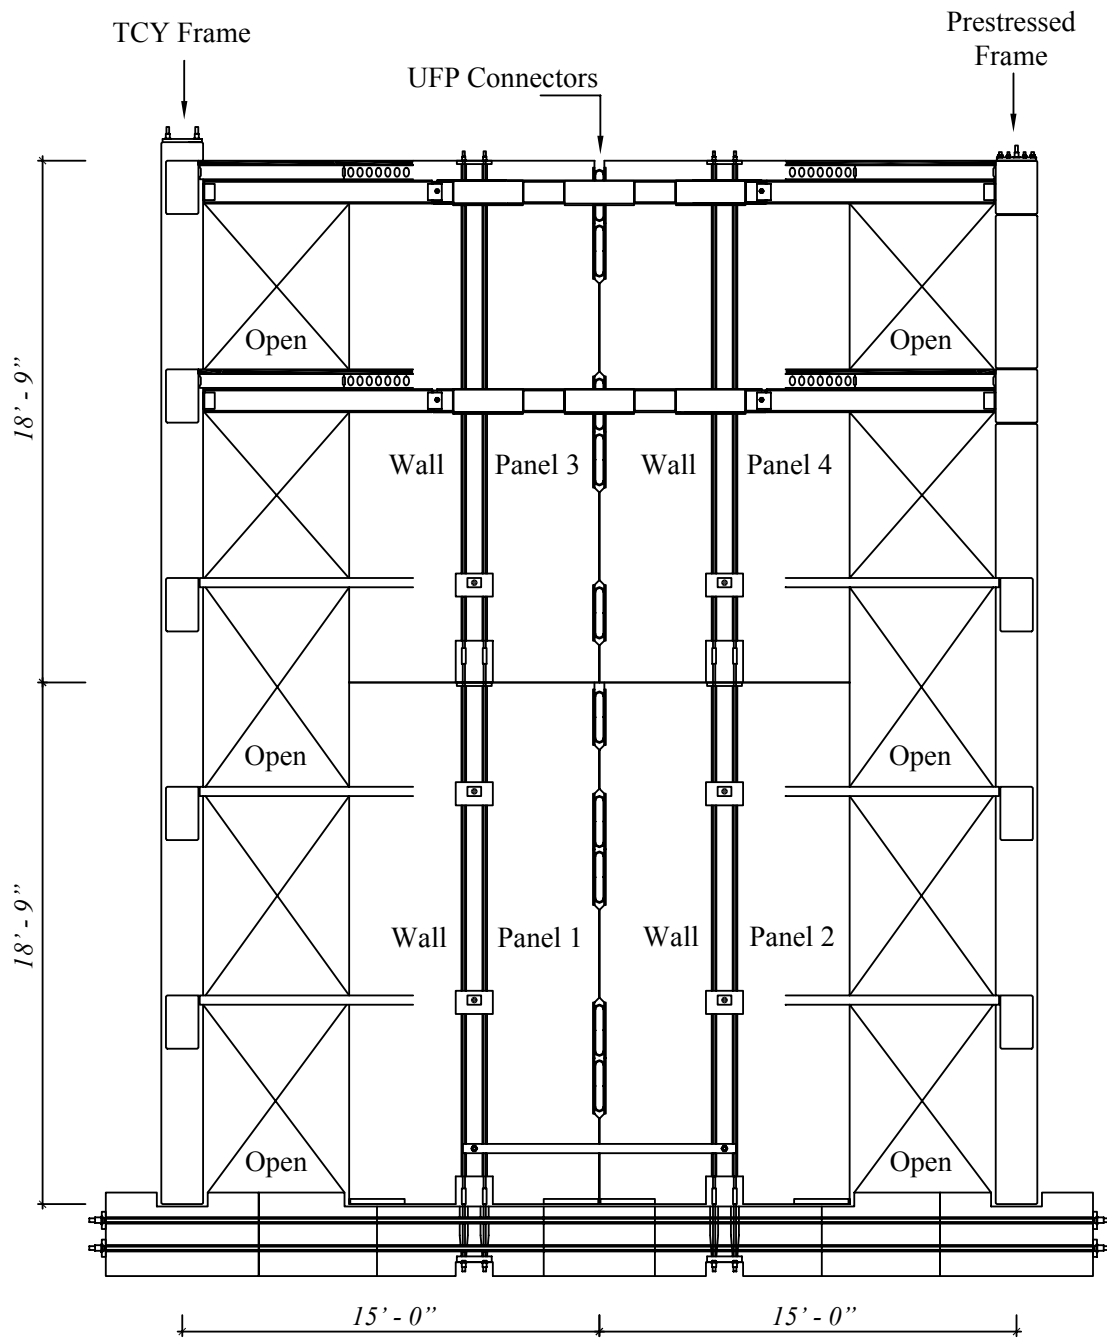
Elevation view of the jointed wall system used in the PRESSS test building [1.18]
